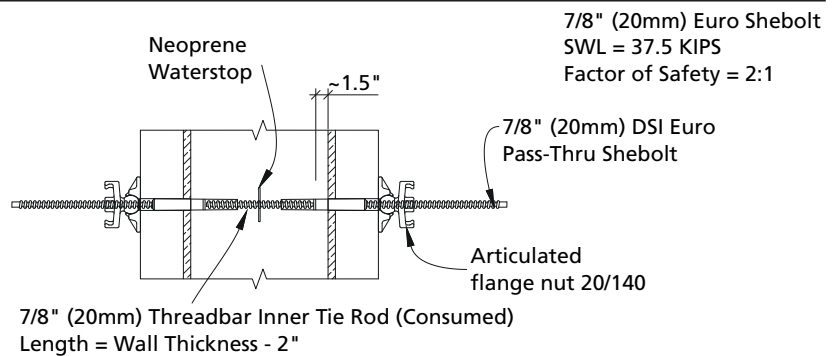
7/8" (20mm) Euro Shebolt
